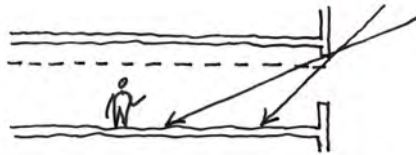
Exposure of the underside of the concrete floor slab allows the floor to absorb internal heat gains
